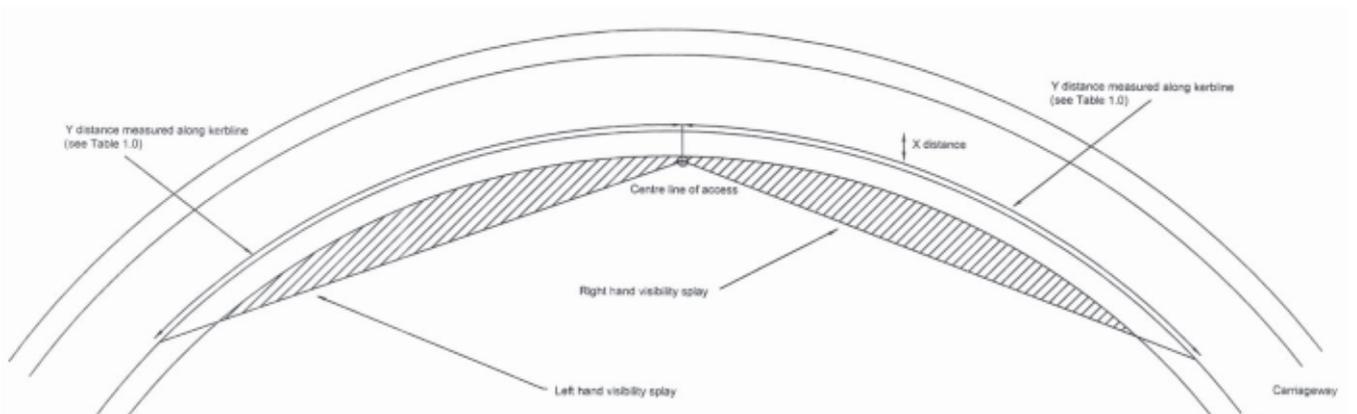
Access visibility splay for traffic exiting development access where access is on the inside of a bend (measured to nearside edge of carriageway)
